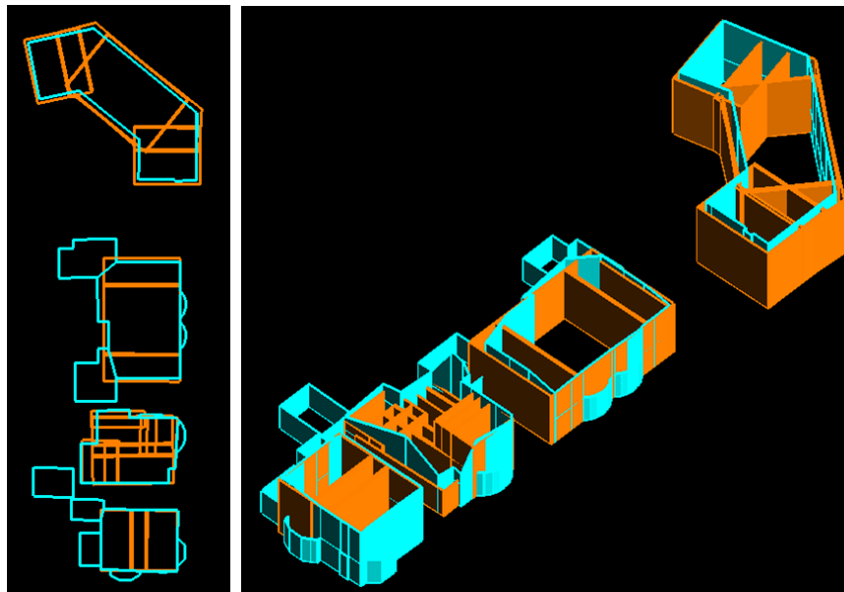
Left: top view on location of walls for data driven (cyan) and model driven (orange) approach. Right: oblique view on reconstructed walls.
